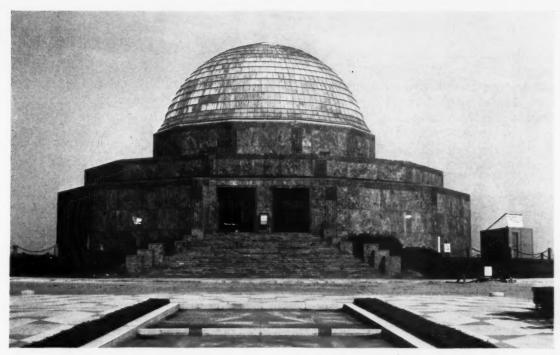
The Adler Planetarium, Chicago, with the new lead coated copper dome completed. Reconstruction also included complete waterproofing of walls, parapets, copings, decks and structural joints.
